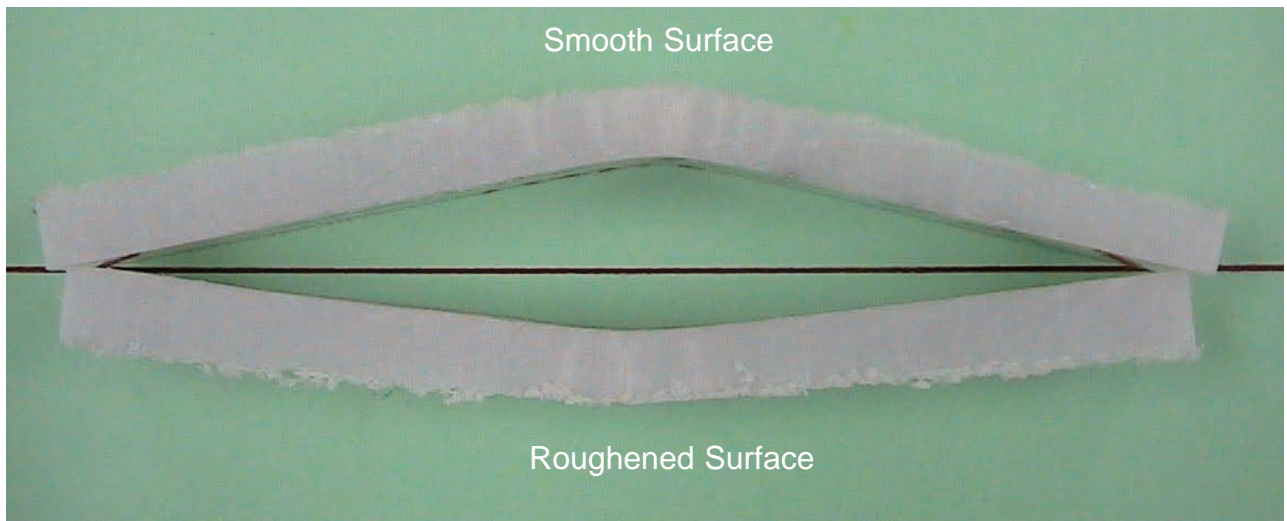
Side View of the Smooth and Roughened Laboratory Flexural-Tested Specimens
